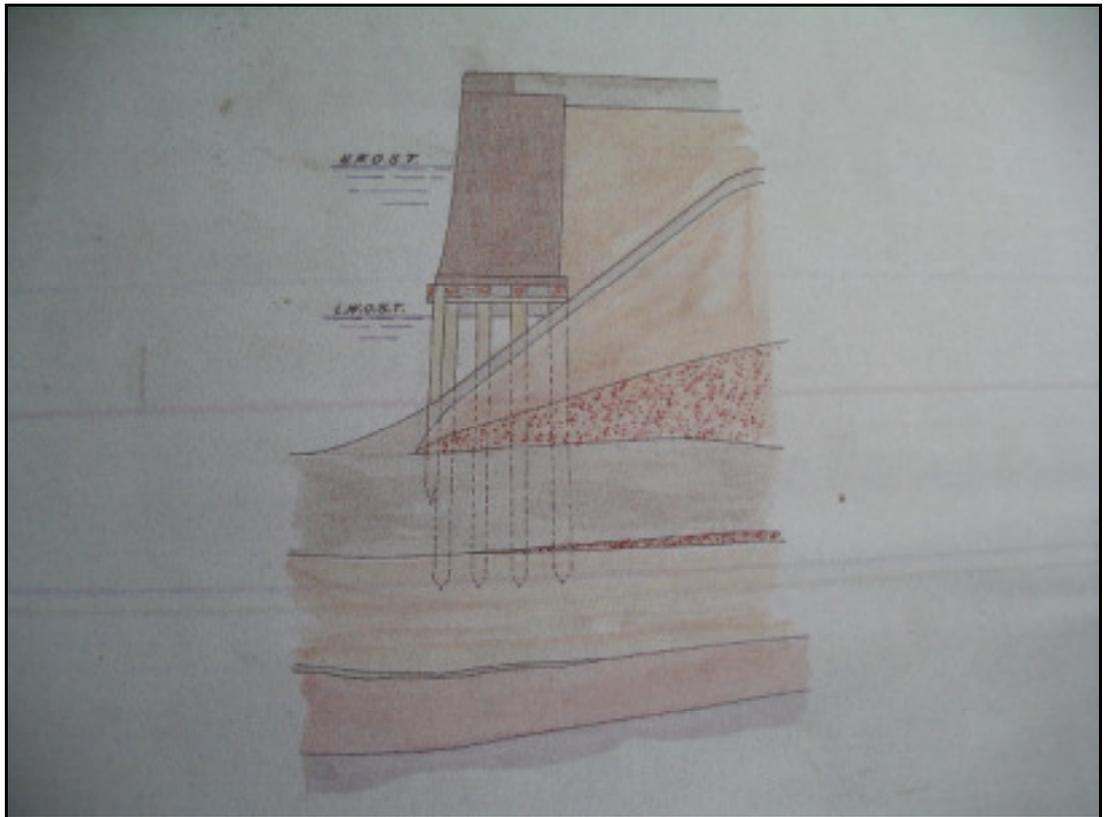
Caledonian Railway. Bowling Harbour. Plan and Cross Sections of Quay Wall. February 1901. NAS RHP120695
